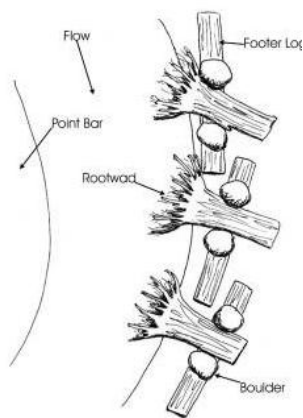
Rootwad revetment planview (Stormwater Management Resource Center).
